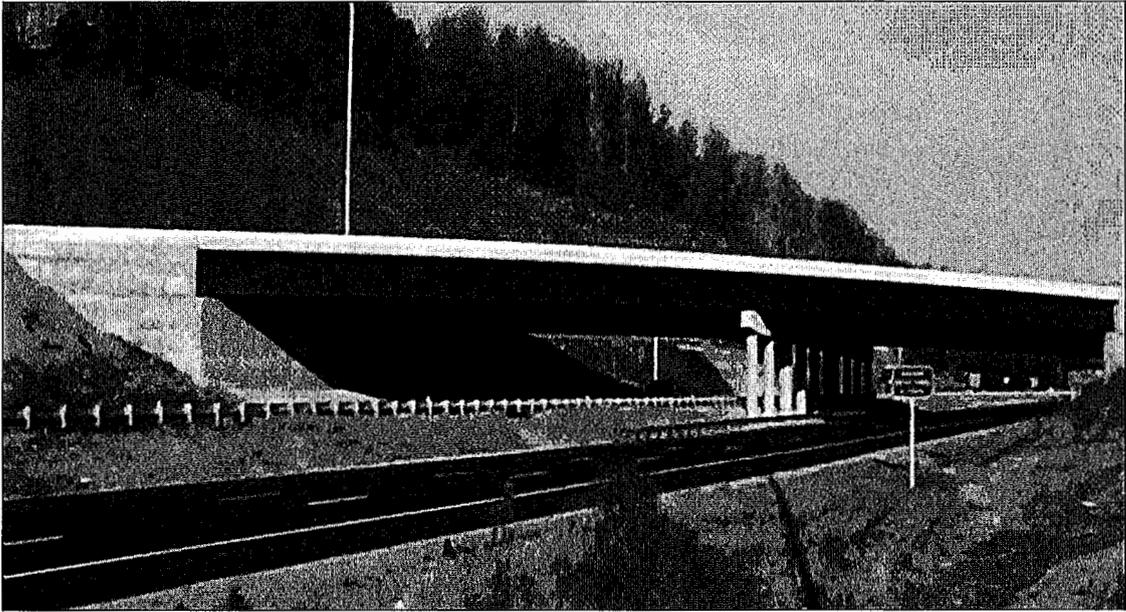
A bridge with pier cap and columns too thin in proportion to girders.
